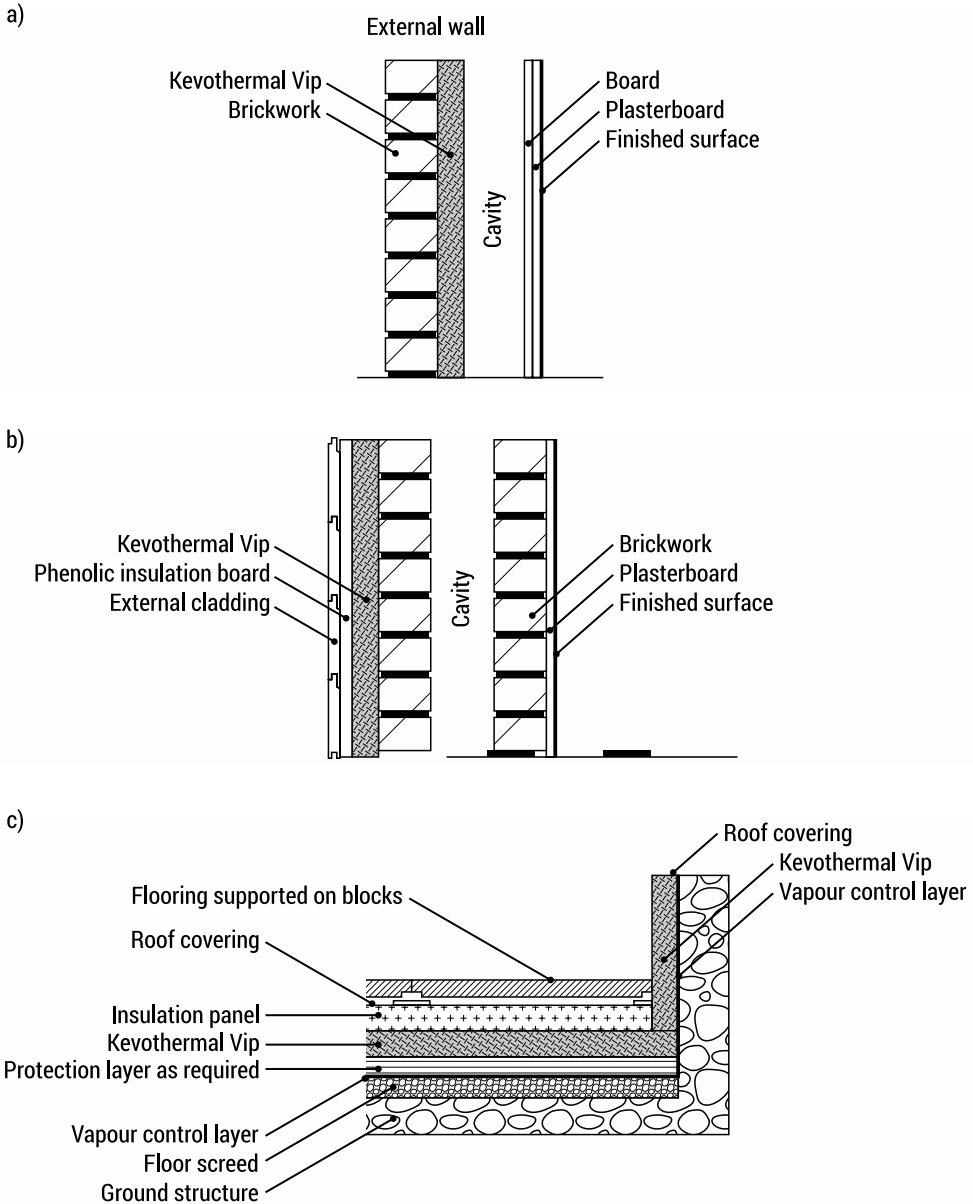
Typical details: (a) – internally insulated external wall detail, (b) – externally insulated external wall detail, (c) – ballasted flat or tapered roof system (Source: BDA Agreement, 2020)
